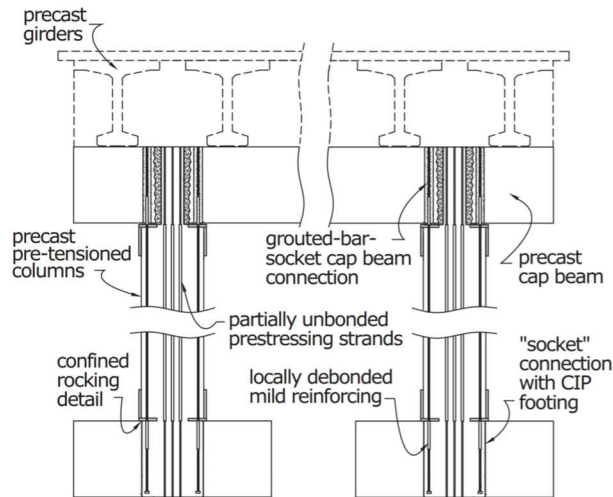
Precast columns and cap beam connection with partially unbonded prestressing strands (Reprinted from Thonstad et al. 2016).
